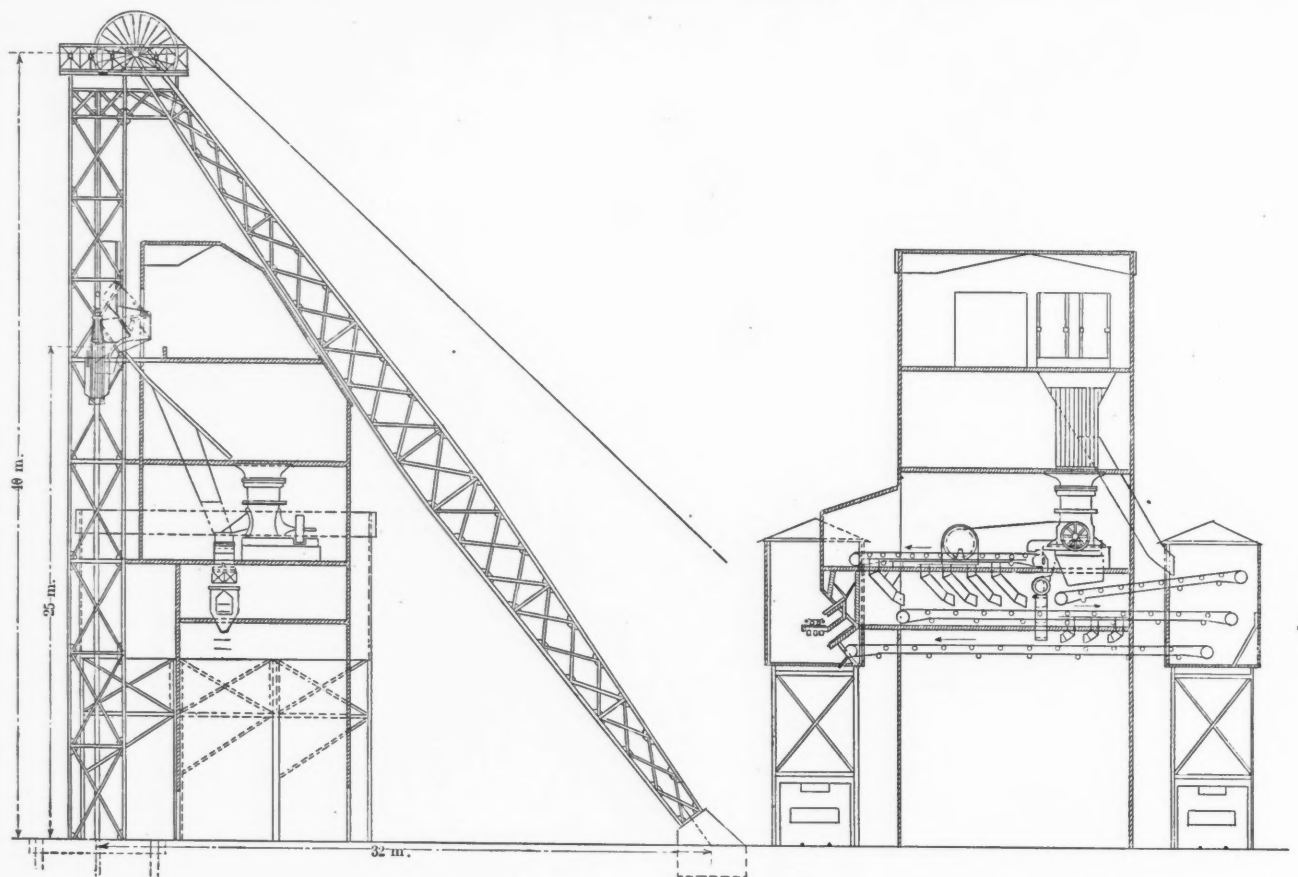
CRUSHING, SCREENING AND CONVEYING APPARATUS IN THE HEAD-FRAME
